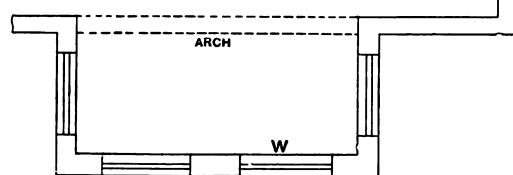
Portion of Front of Main Floor Plan, Showing Windows, Doors, Etc.—Scale, $\frac{1}{4}$ Inch to the Foot.
